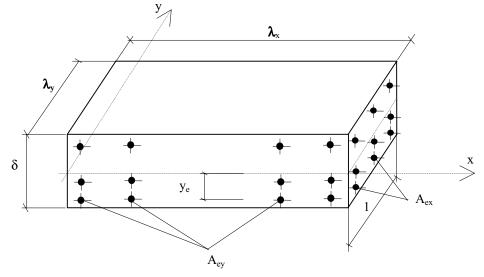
Multilayer reinforced steel-concrete composite slab element.
